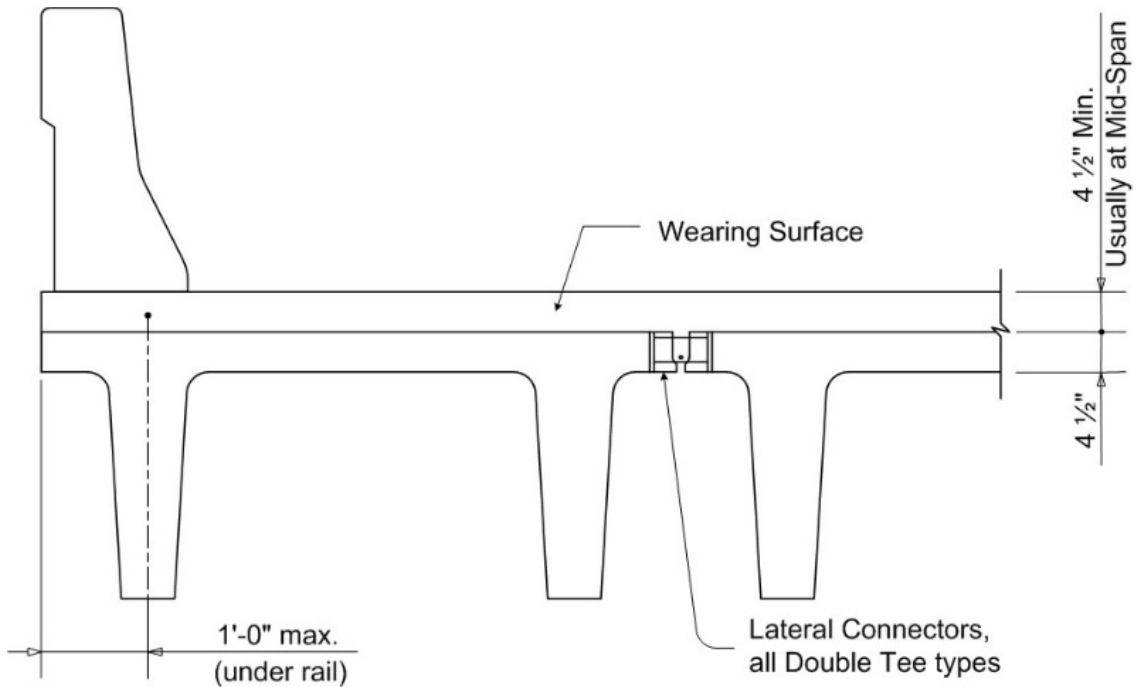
Prestressed Double Tee Beam with Lateral Connectors
